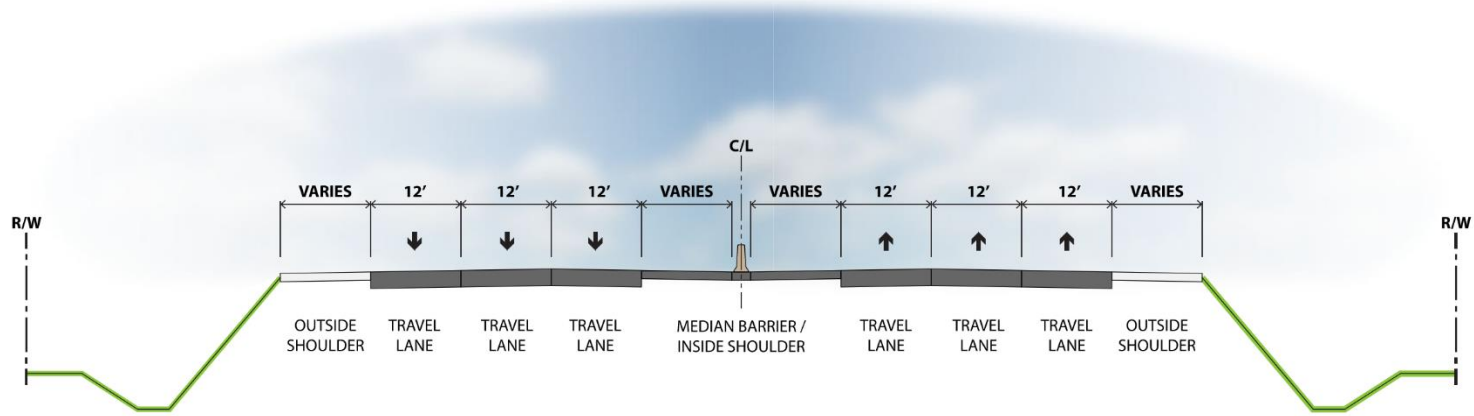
Typical Section of I-70 from West St to South Split in 65/70 Downtown Spoke
